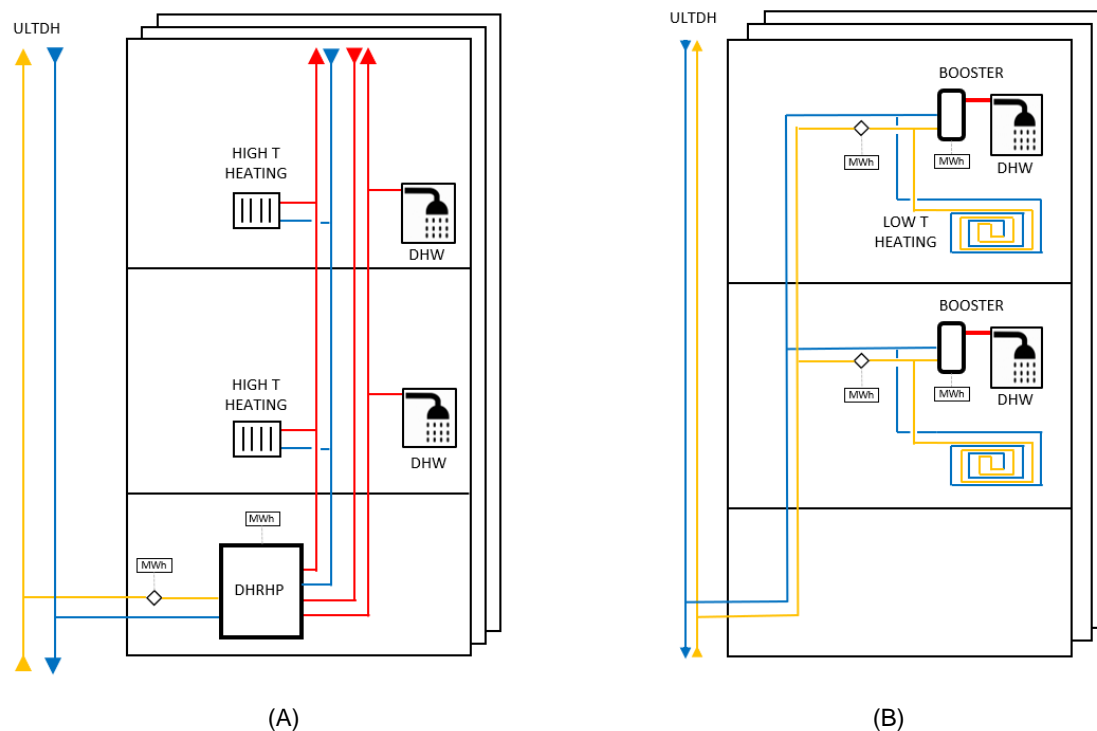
Central metering (left) and metering per dwelling (right) in multi dwelling building
